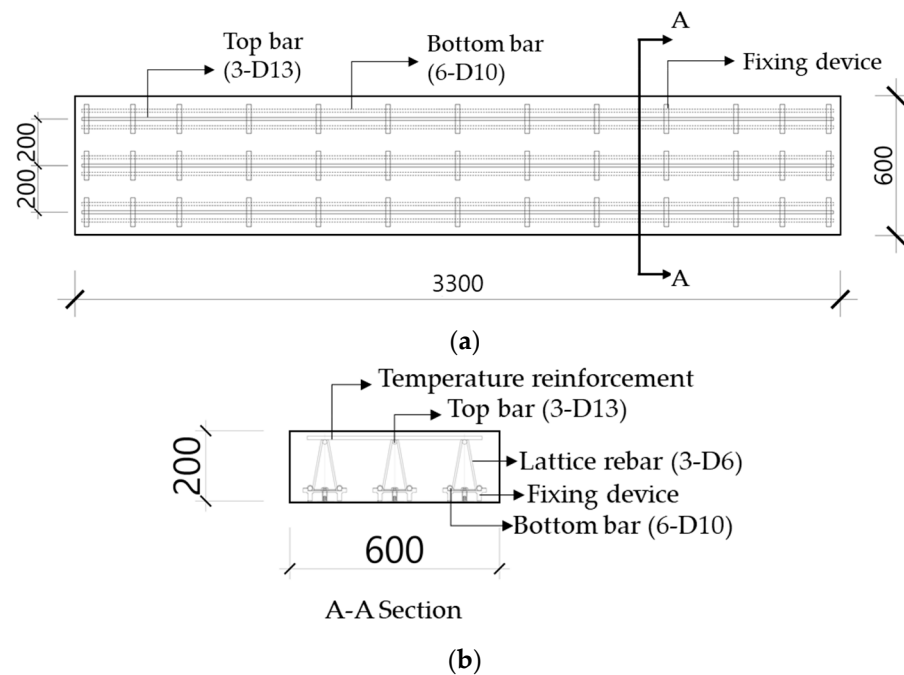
Flexural performance test specimen details: (a) plan view; (b) section view (unit: mm).
